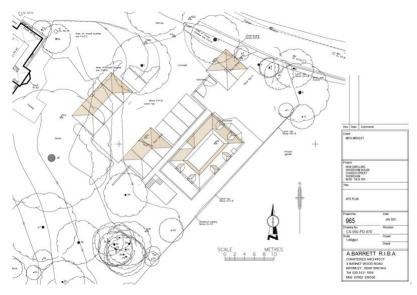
The proposed site block plan for the development by A. Barrett (dated January 2021).
